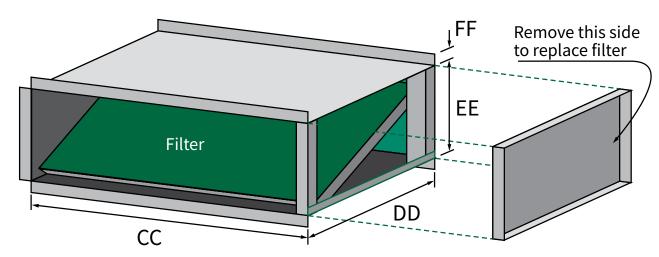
Front view of the FV Preconditioner with attached indoor filter assembly.
